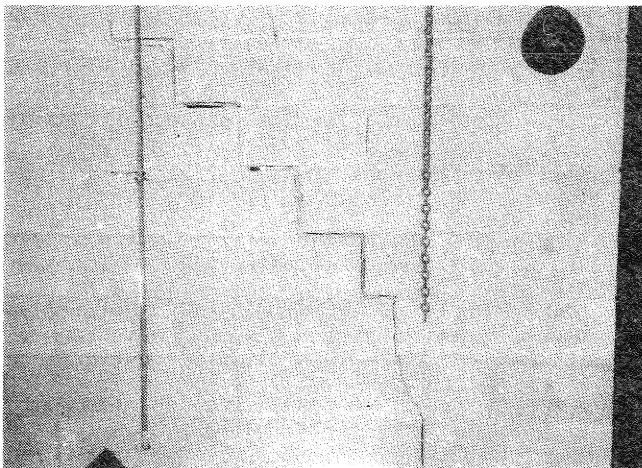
Damaged unreinforced concrete block walls
